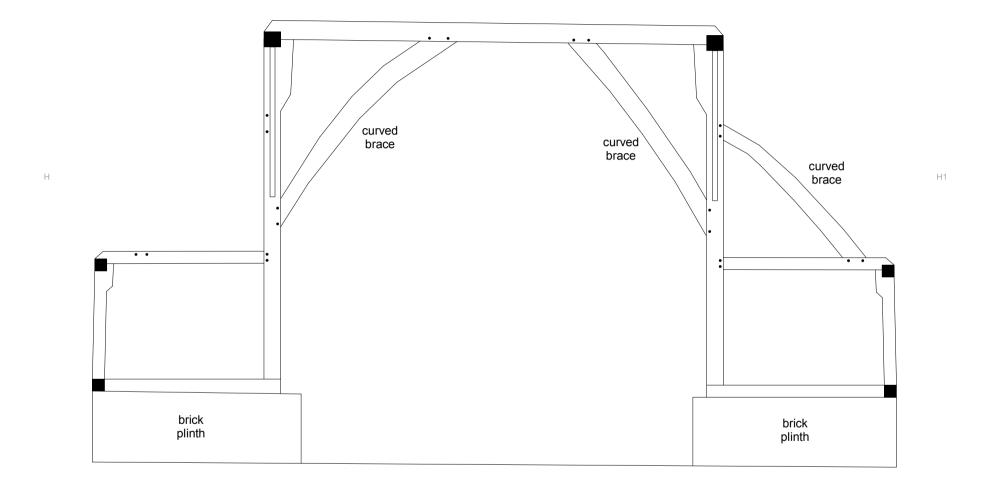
Structure 4 (17th-century aisled barn): cross-section of truss H.
